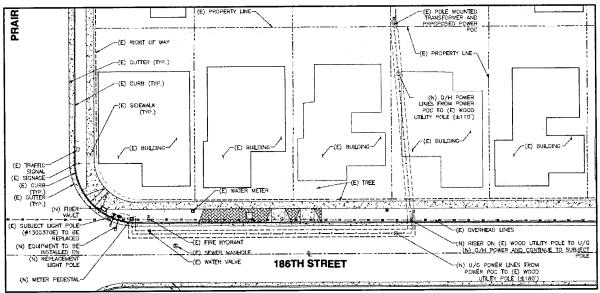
Underground electrical connections for the Applicant (Source: Plans page A-1, panel 1).
